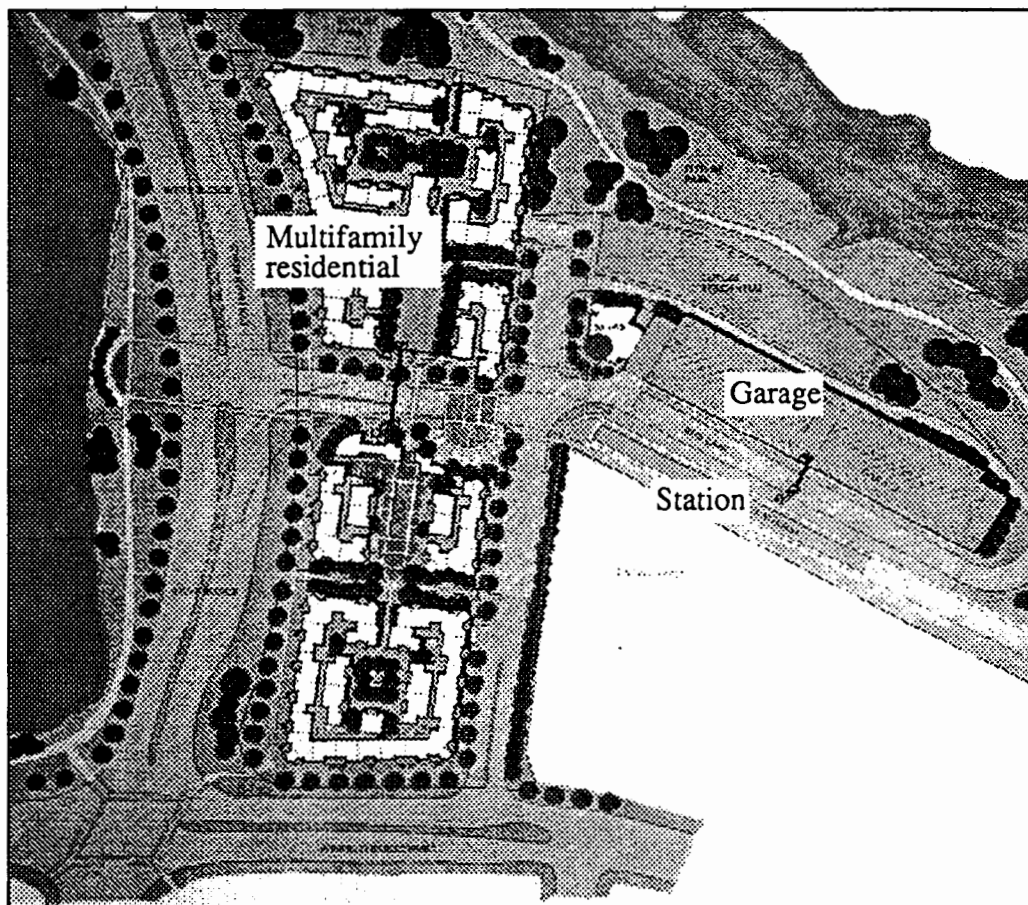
Plan for the Almaden station area on the Santa Clara County Transit Light Rail line.
